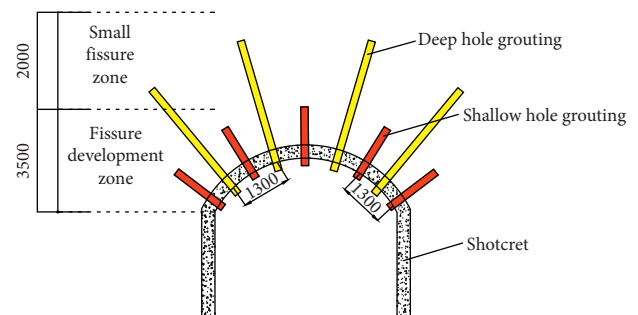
Schematic diagram of grouting hole design (unit: mm).
